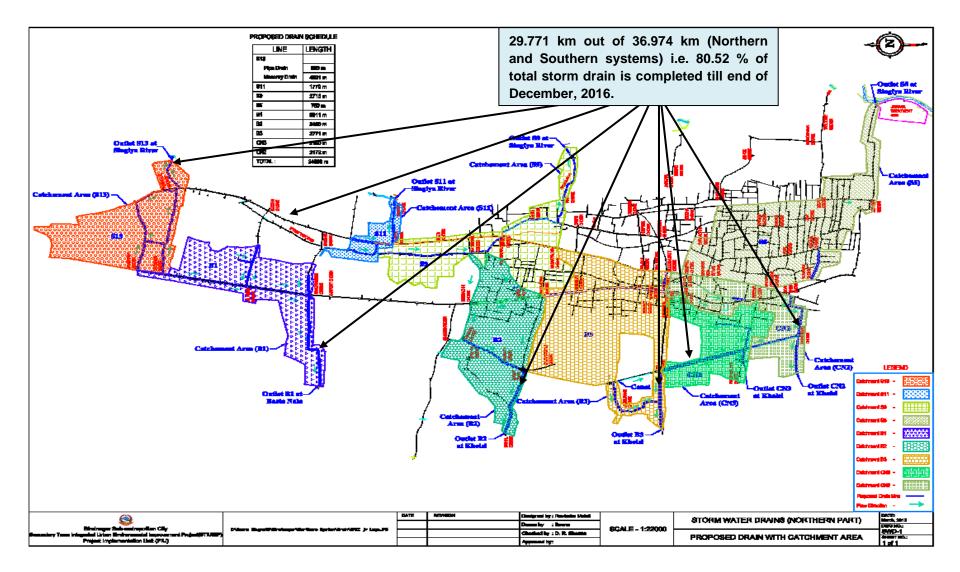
Proposed Storm Water Drains in BSMC (Northern Drainage System)
